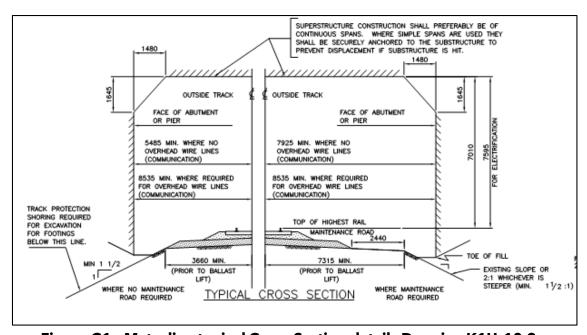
Metrolinx typical Cross Section details Drawing K1U-10.2m
